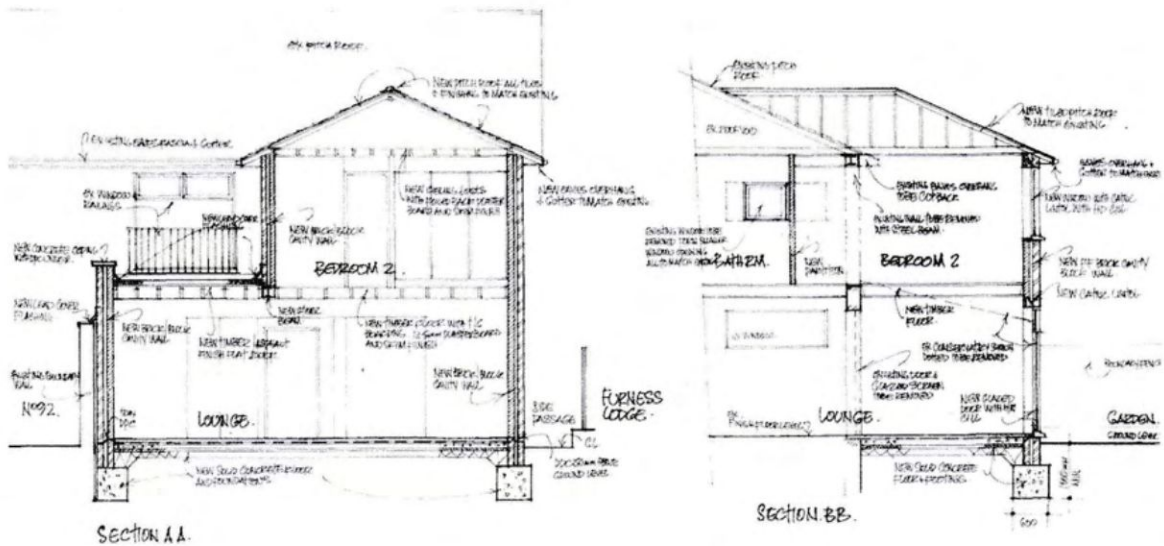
2003-approved sections showing rear extension to 94 Temple Sheen Road (03/3092/HOT)
